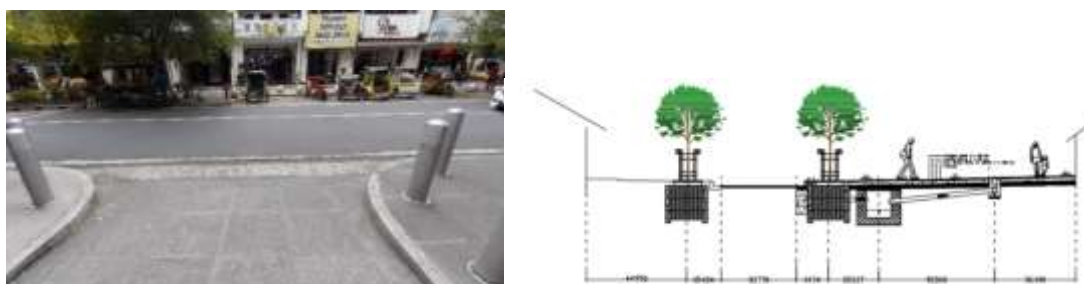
Photos and Sections of Malioboro Street with Terrazzo and Asphalt Paving
